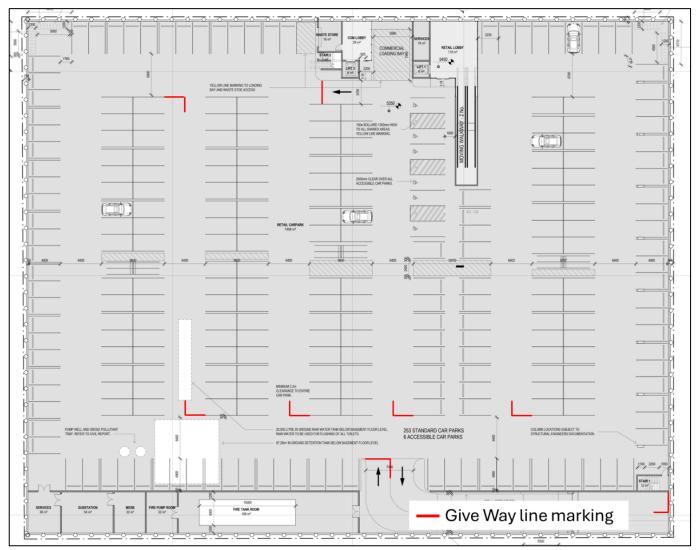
Proposed Basement Carpark Give-Way Linemarking
